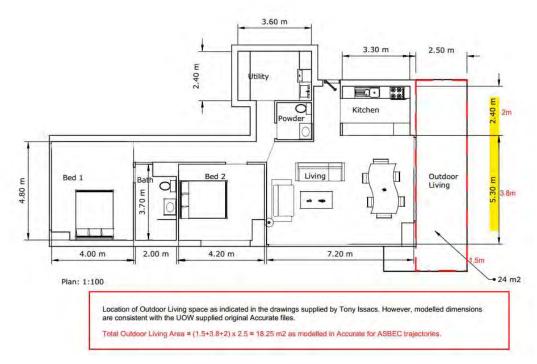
Outdoor Living Area – Apartment Archetype-TCPL Edit
